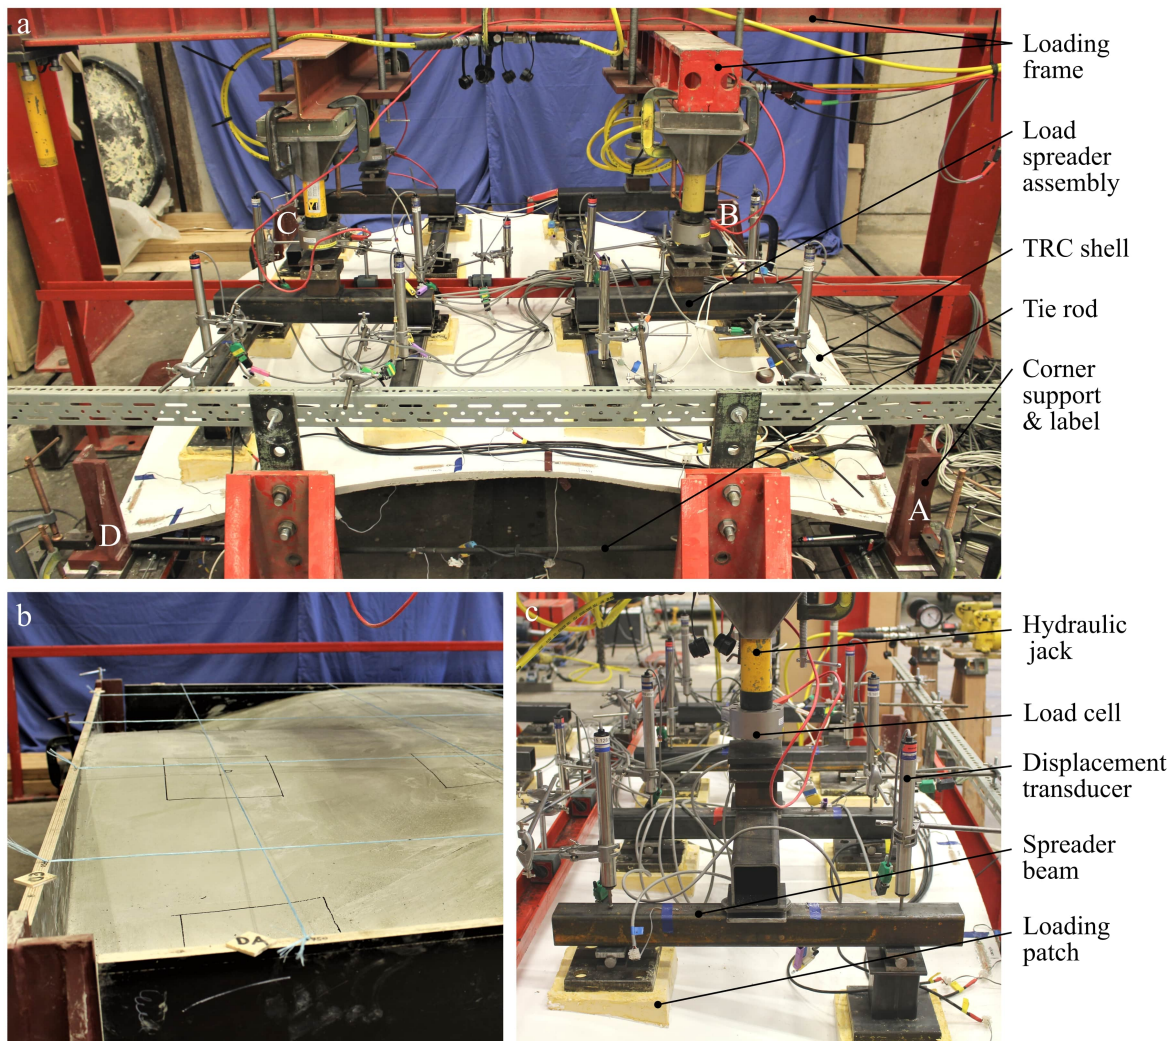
Test arrangement and loading of shell specimens, showing a) an overview of the test set-up b) setting out of loading points and c) load-spreader assembly with instrumentation.
